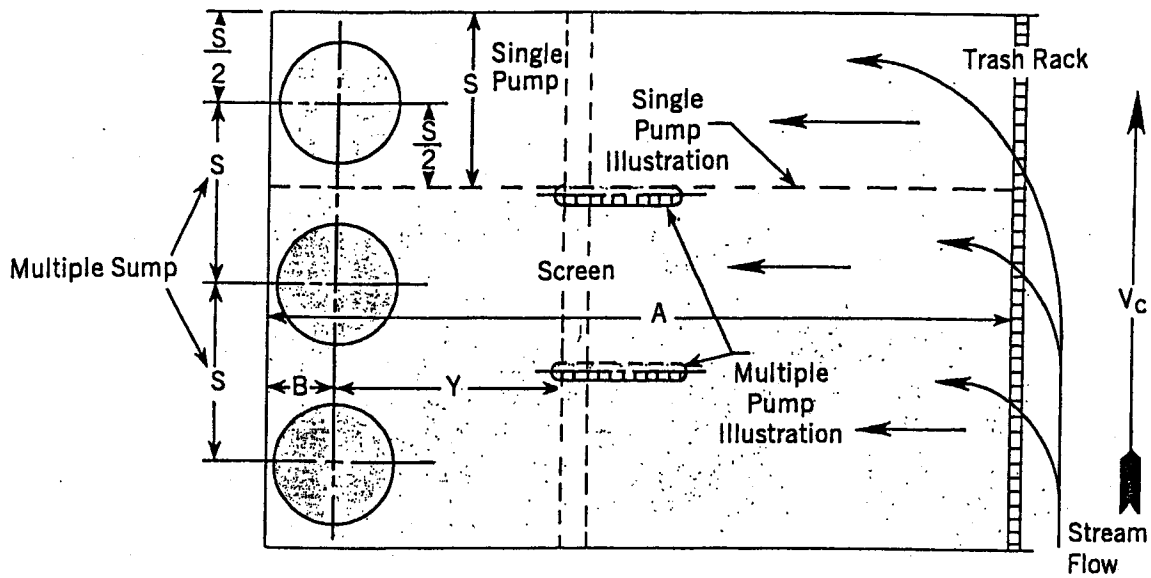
SUMP DIMENSIONS PLAN VIEW
